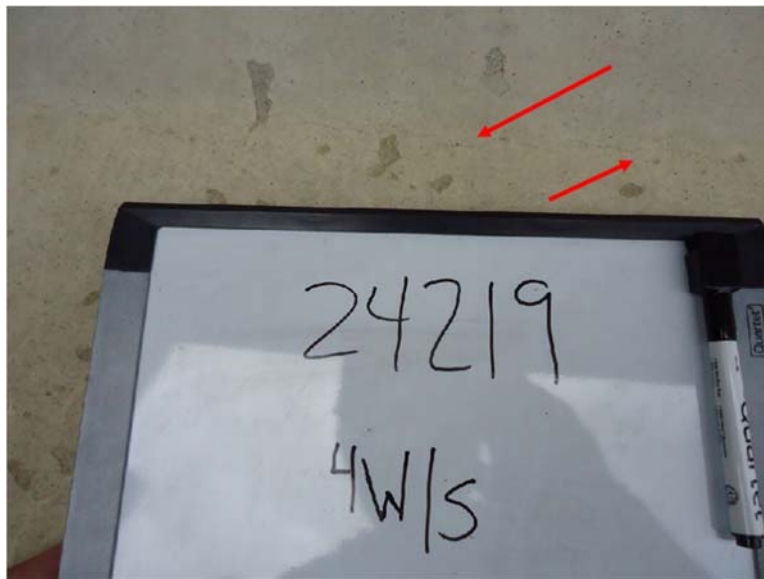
Horizontal crack at top flange/web interface (4W-S)
